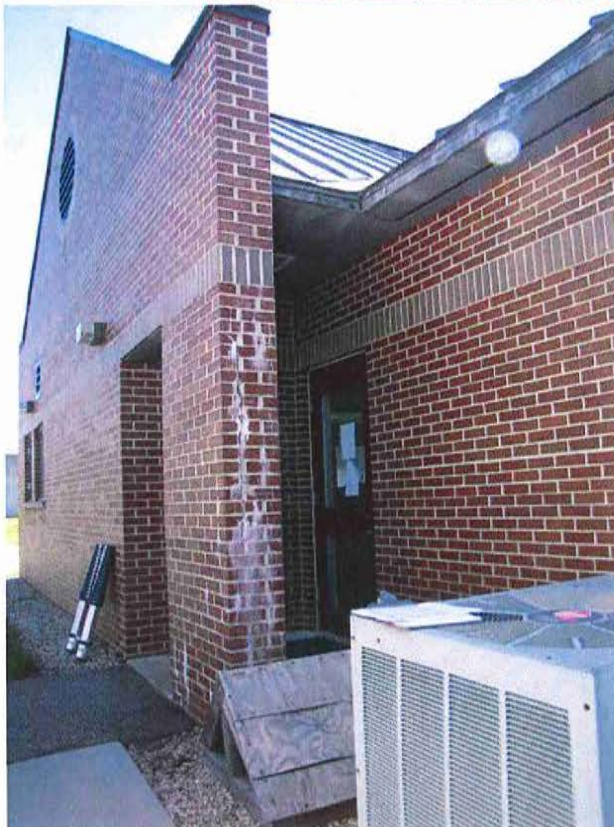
Lab/Admin - General view near NW corner of building at the main entry into building. Note the valley line at re-entrant roof eave corner and outside ceiling above the entry, which can produce a cold roof above to promote ice dam formation.
